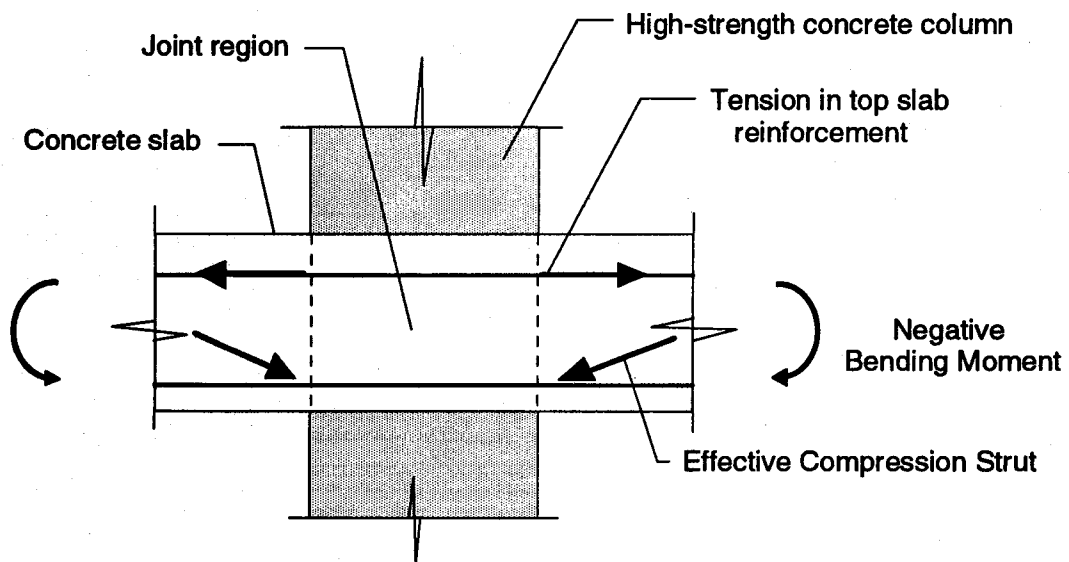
Stresses at Joint Region (Specimens with Loaded Slabs)
